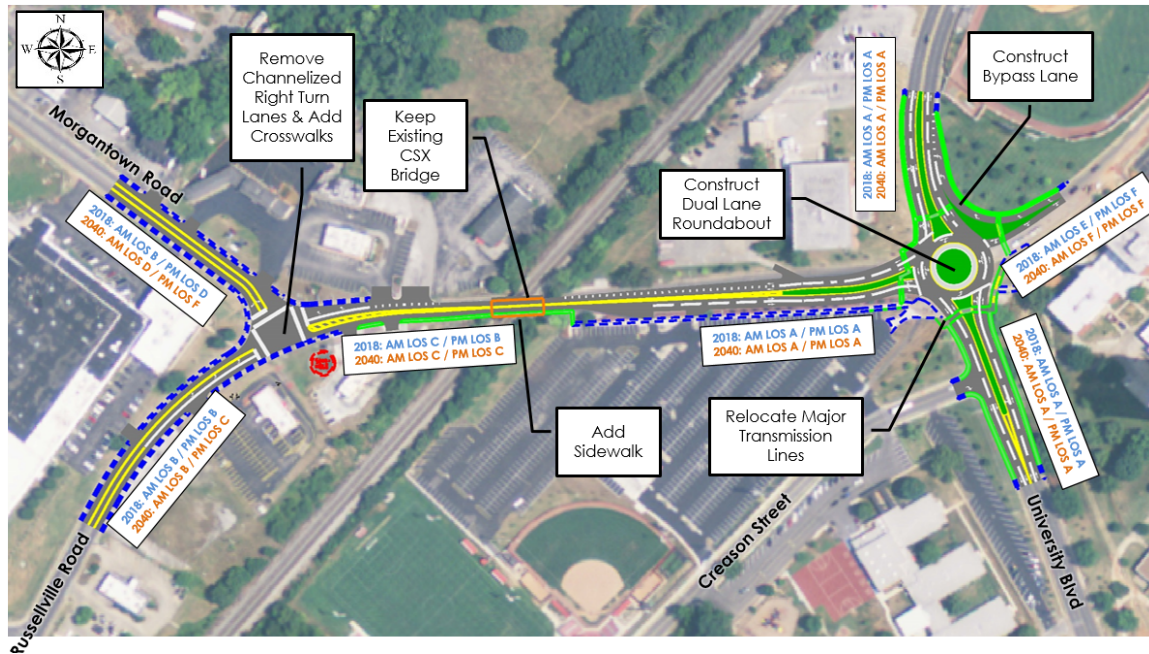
Roundabout at University Boulevard and Sidewalk on Russellville Road
